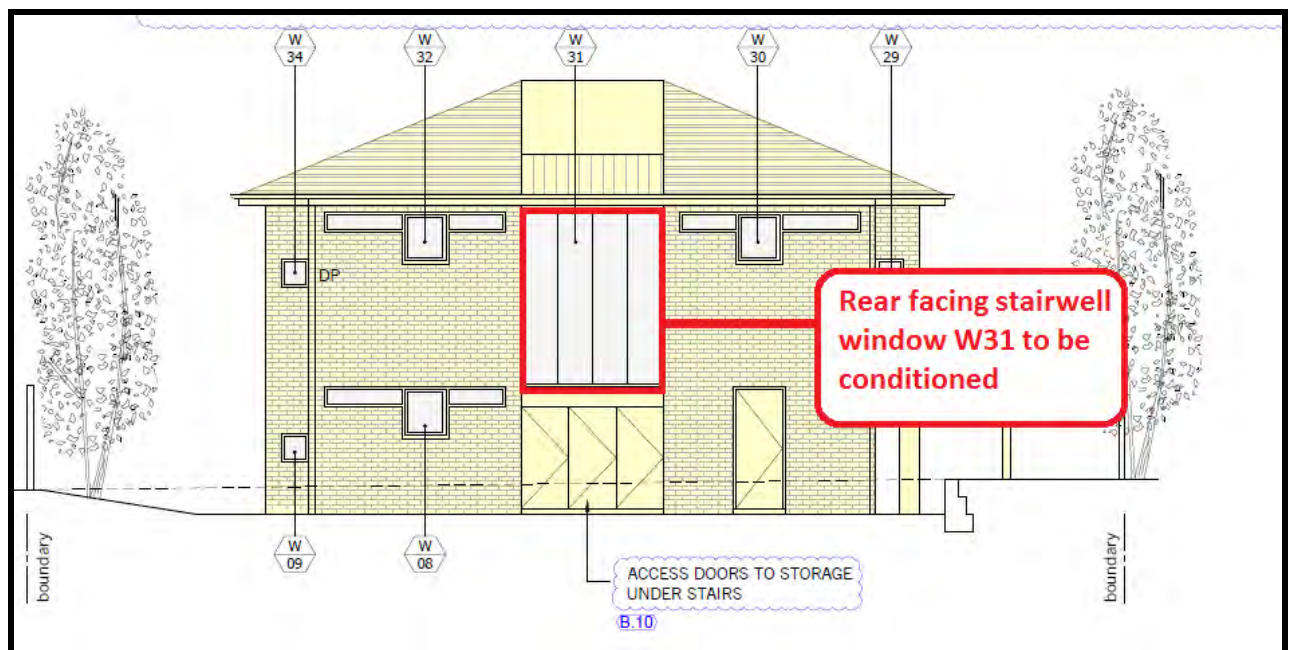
Rear facing stairwell window to be conditioned to incorporate obscure glazing
